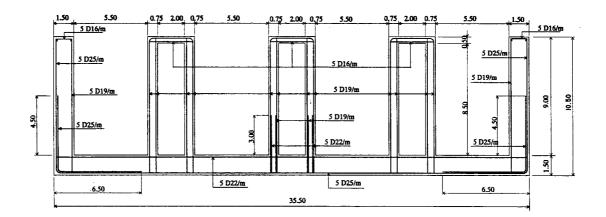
Arrangement of Reinforcement for Intake Canal (Flume Section)
